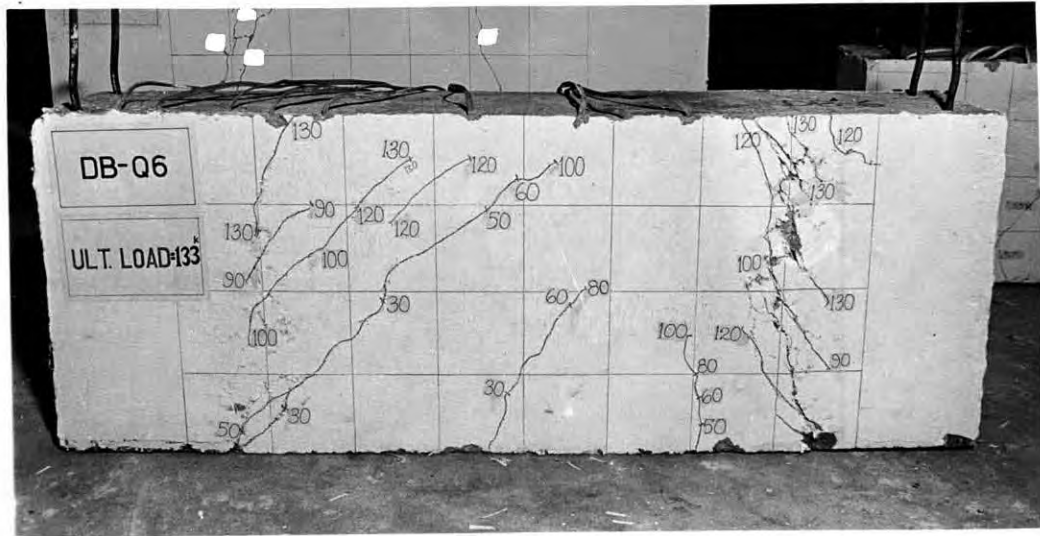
Mode of Failure and Crack Pattern of Beam DB-Q6
